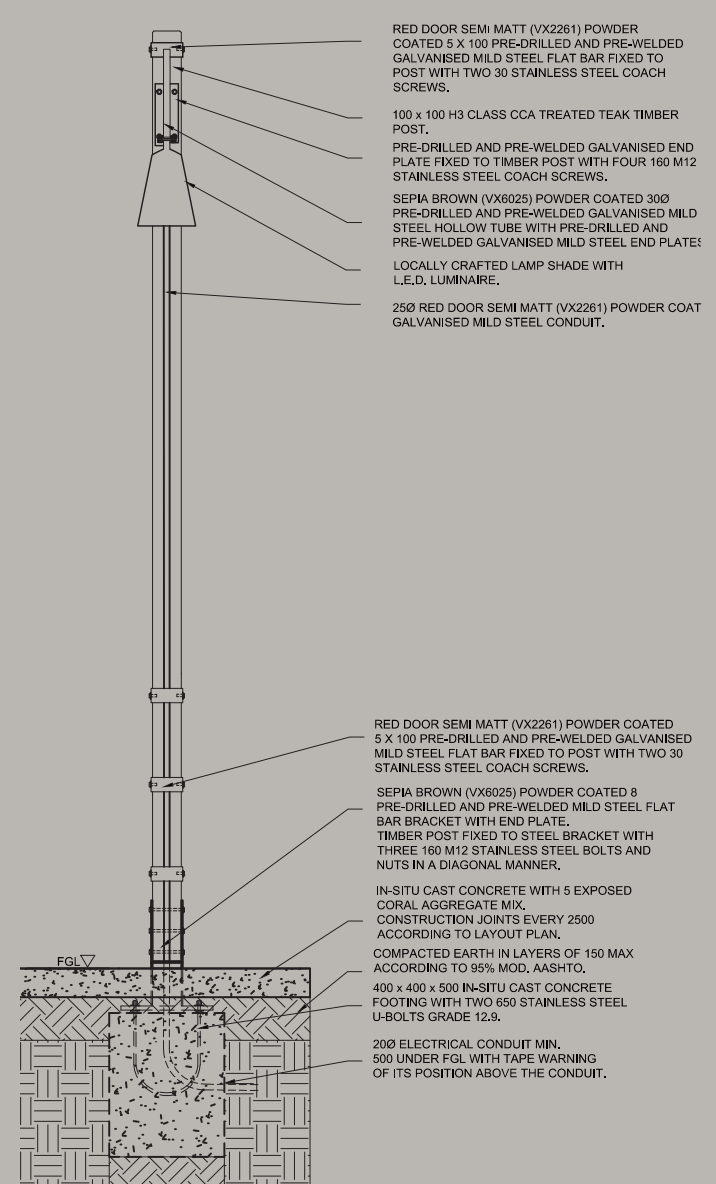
Detail Elevation (1:20) of Lamp Post (Author, 2014).
